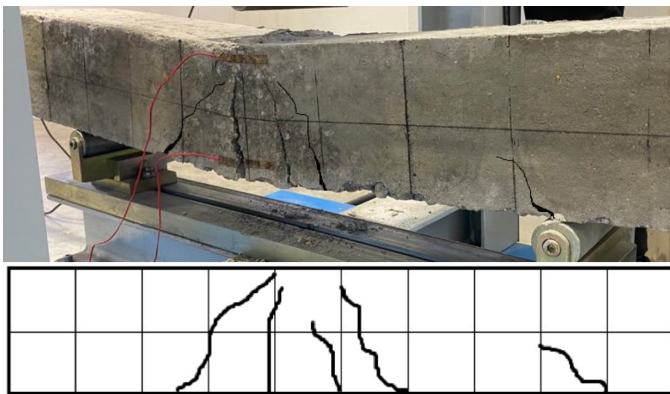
Reinforced concrete beam's crack pattern with 10% POFA and 20% EPS
